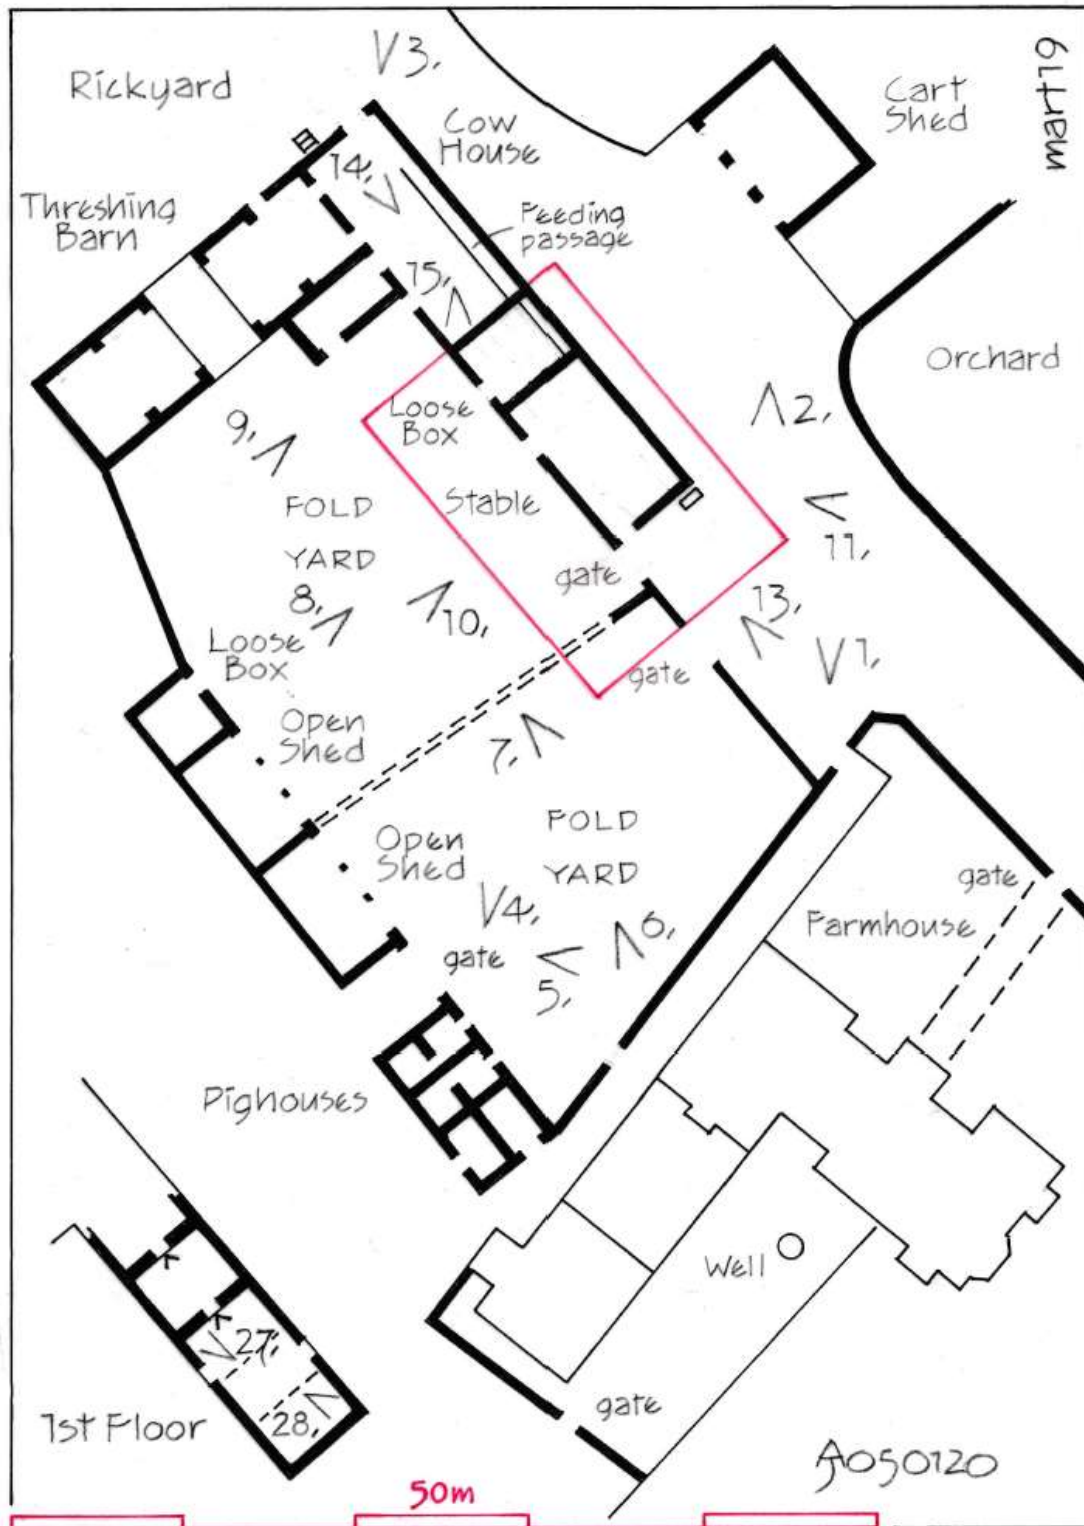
; Plan of the farm buildings; their original functions with photo locations.
